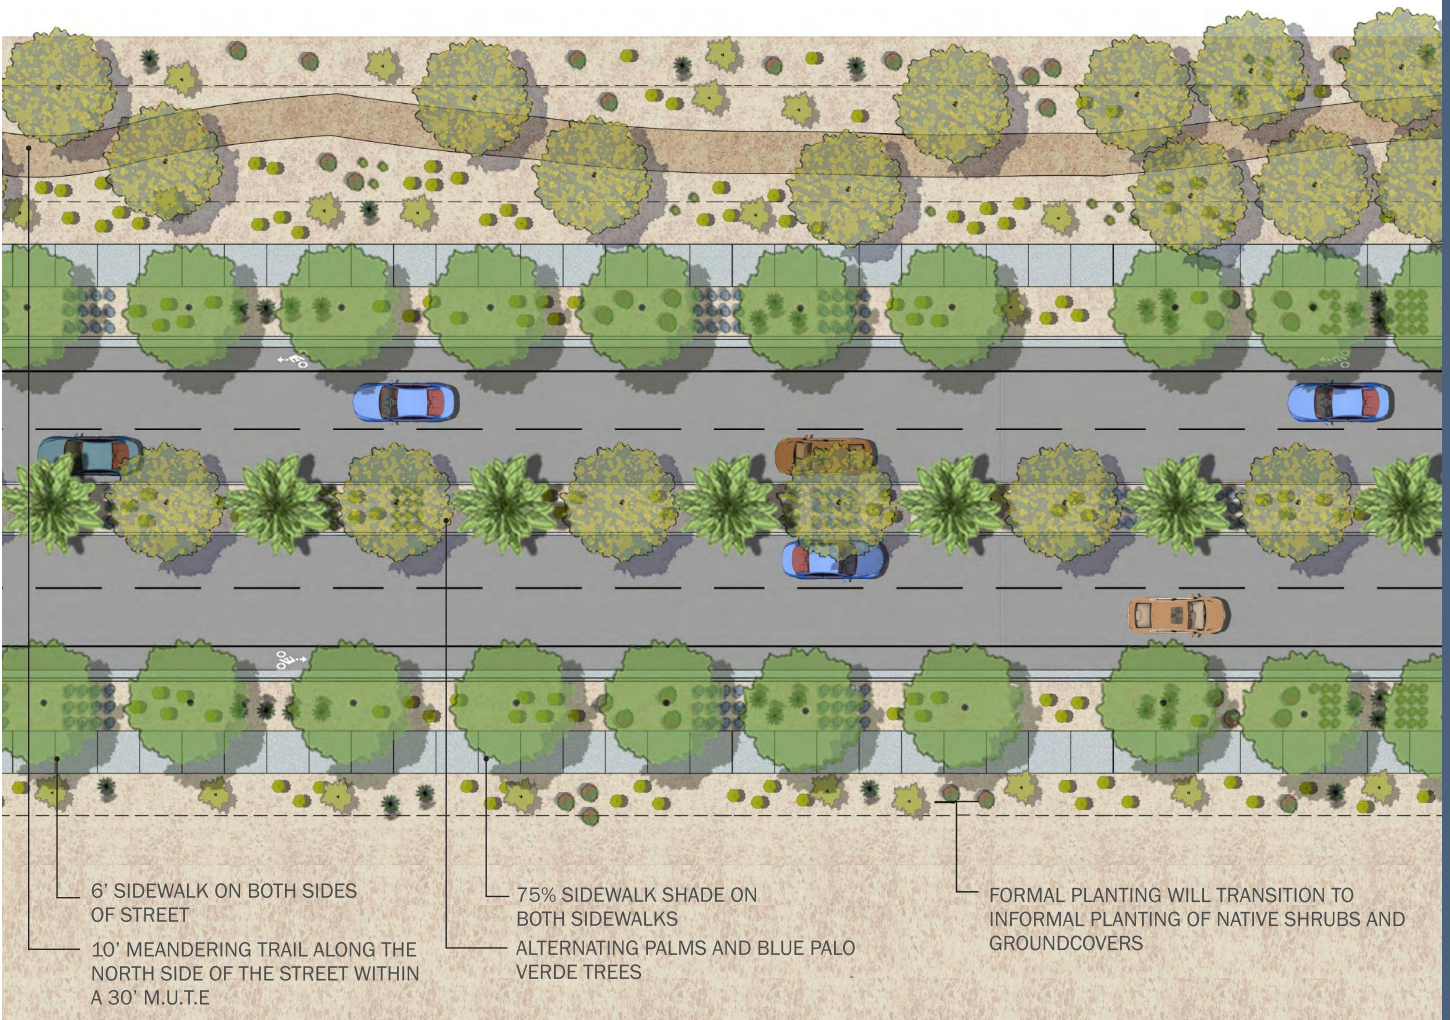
Conceptual Street Section - Gila Foothills Parkway, Northern Segment (View Looking West)
